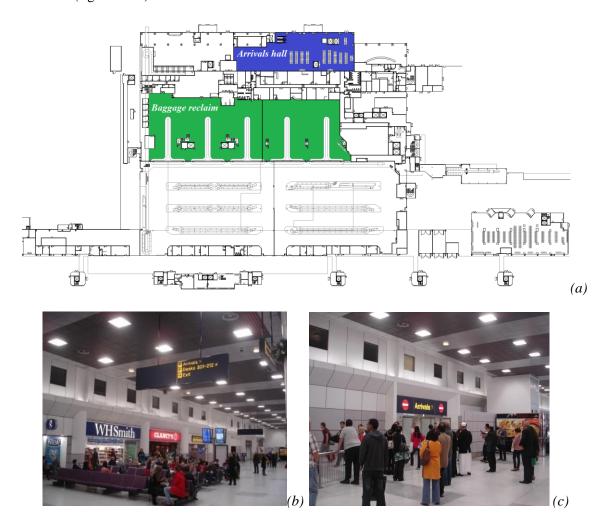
MAN T2 ground floor (a) plan, (b) & (c) views in arrivals hall.
